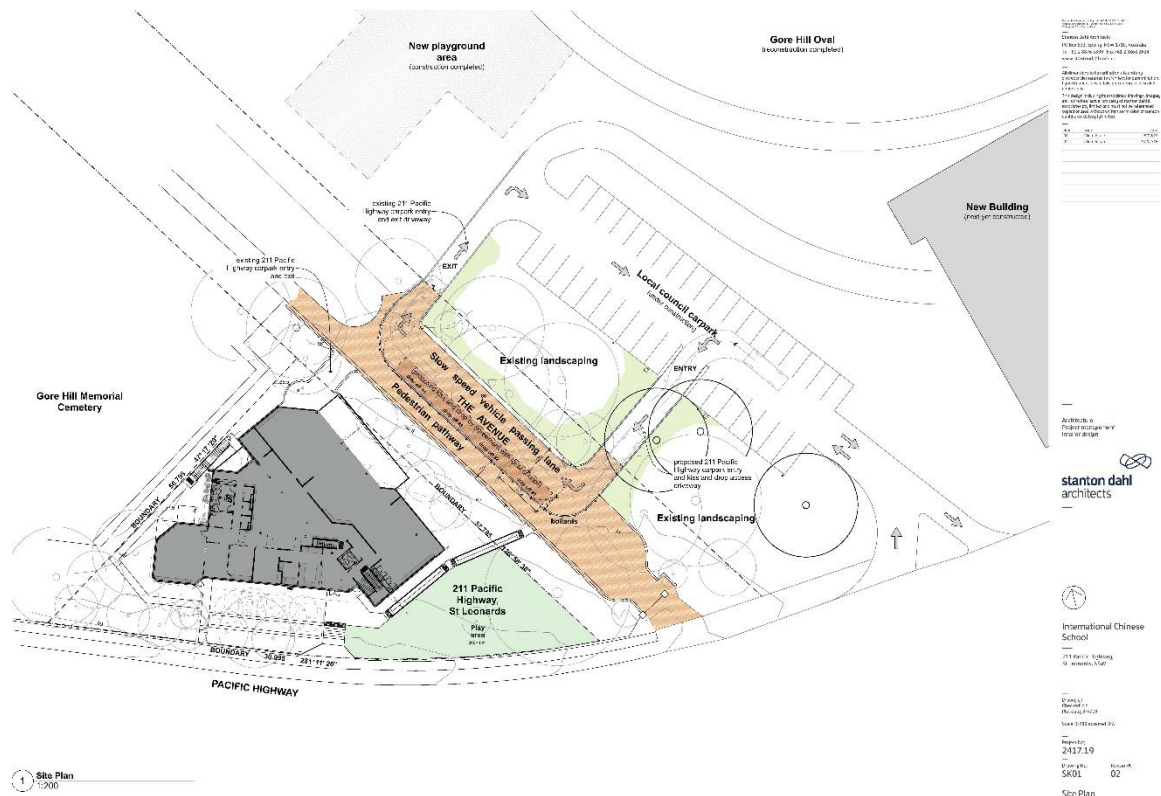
Current site plan for the proposed new building and ‘kiss and drop’ area for parents and students (plan view).
